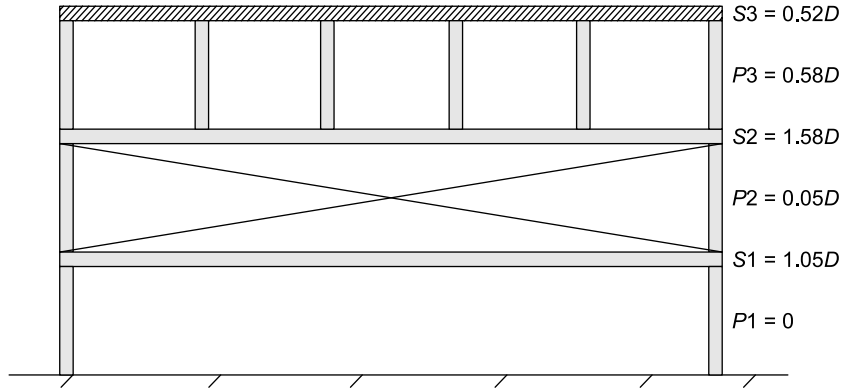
Installation of Reshores Under Slab 2 on Day 26.
